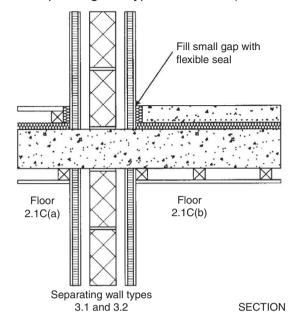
Floor type 2.1C - wall types 3.1 and 3.2
